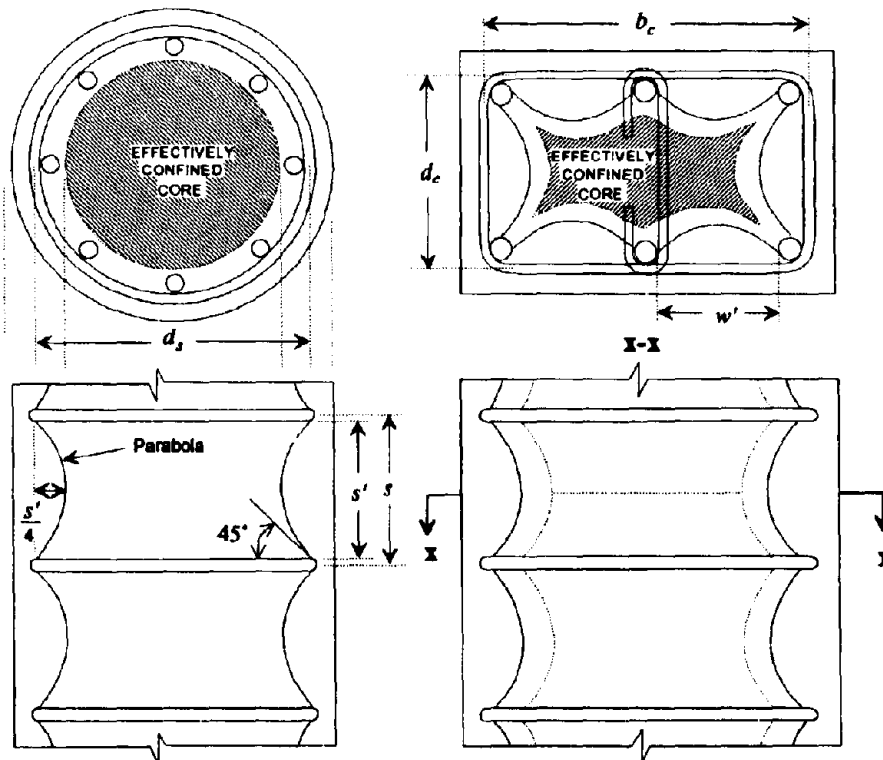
Confinement Mechanism for Circular and Rectangular Cross Sections
